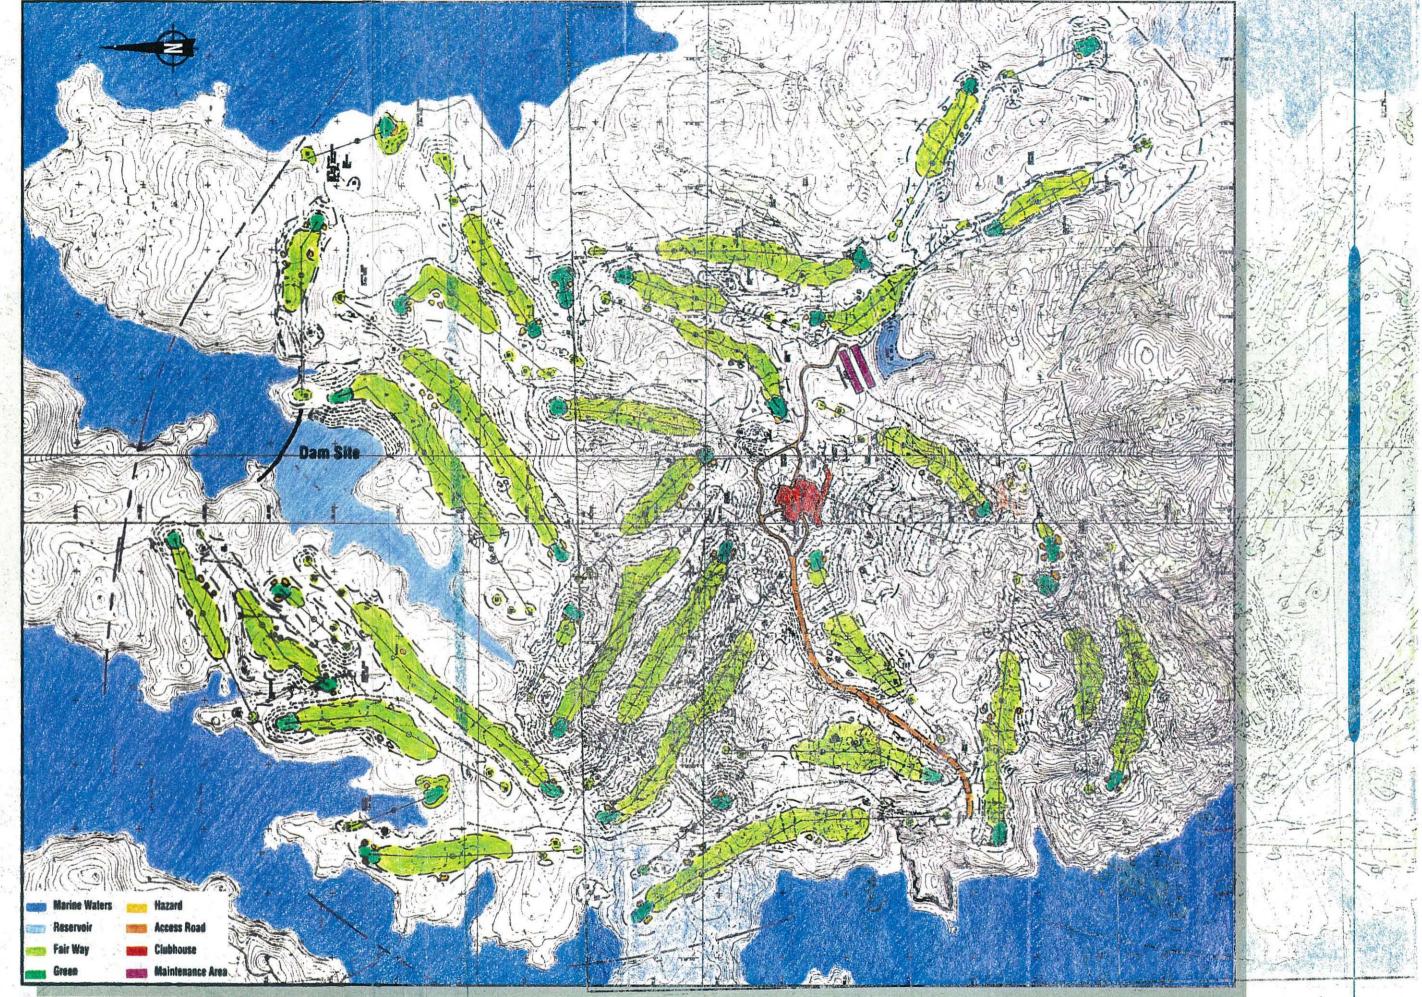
The Hong Kong Golf Centre – Kau Sai Chau Master Layout Plan April 1994
